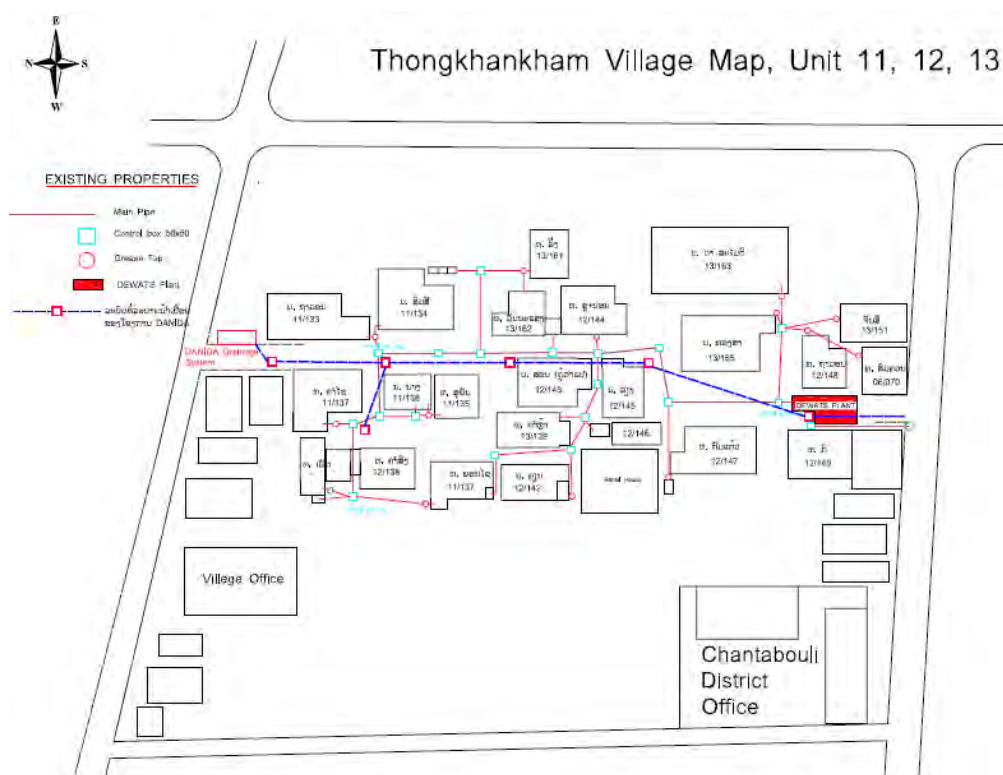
Layout of CBS Sewer Network Plan
